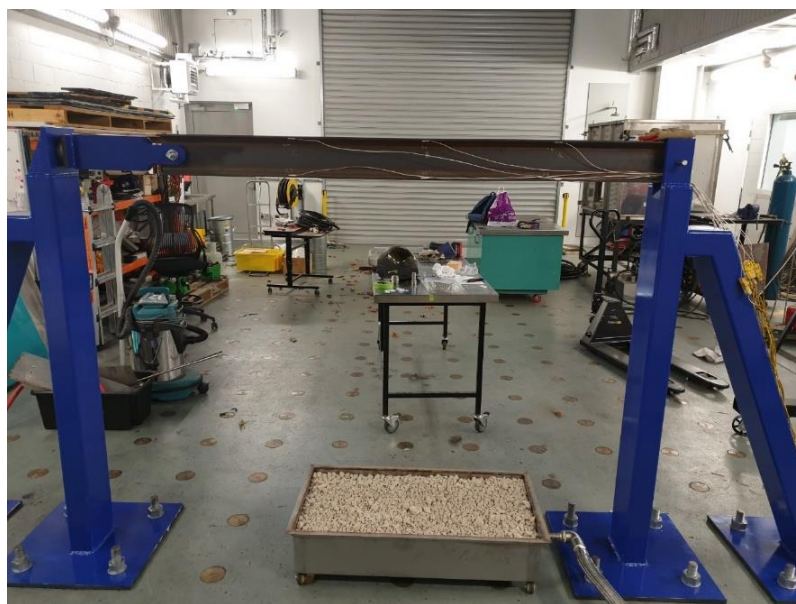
Thermal test set up showing the beam, frame and the gas burner
